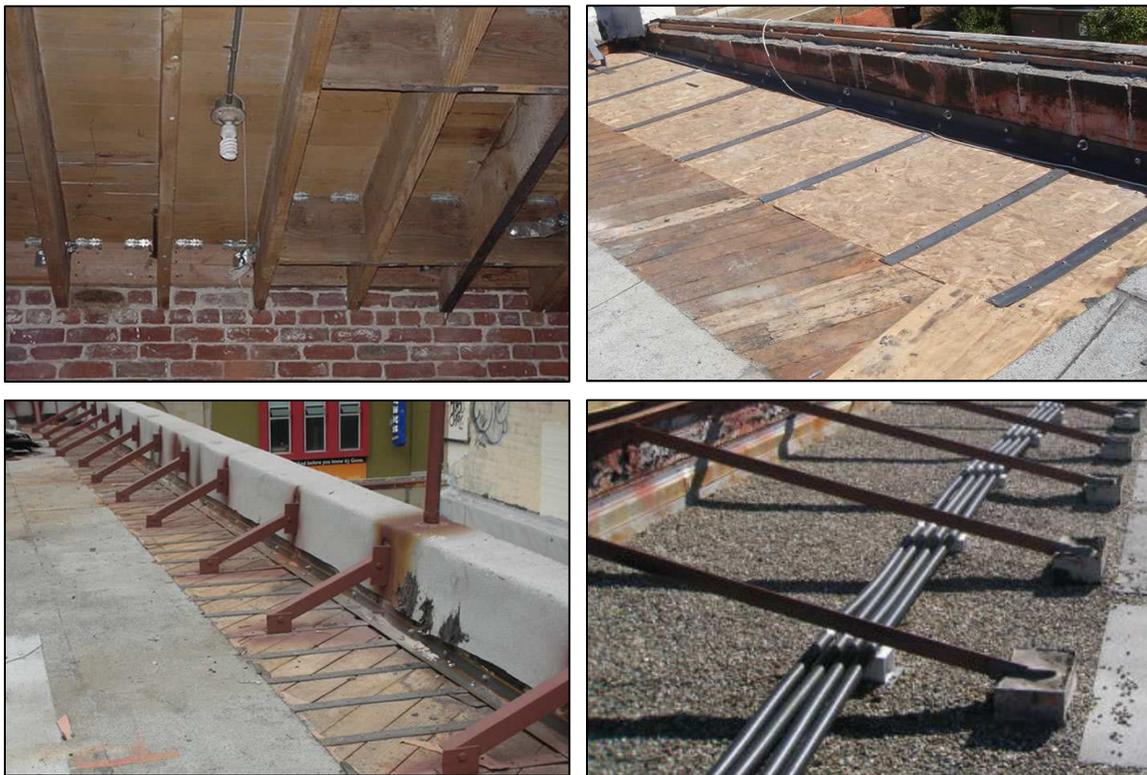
Parapet Bracing Phases – Sheathing/Blocking Installed (Top Left), Roof Anchors Installed (Top Right), Braces Installed (Top Right), Finished Roof (Bottom Right)
